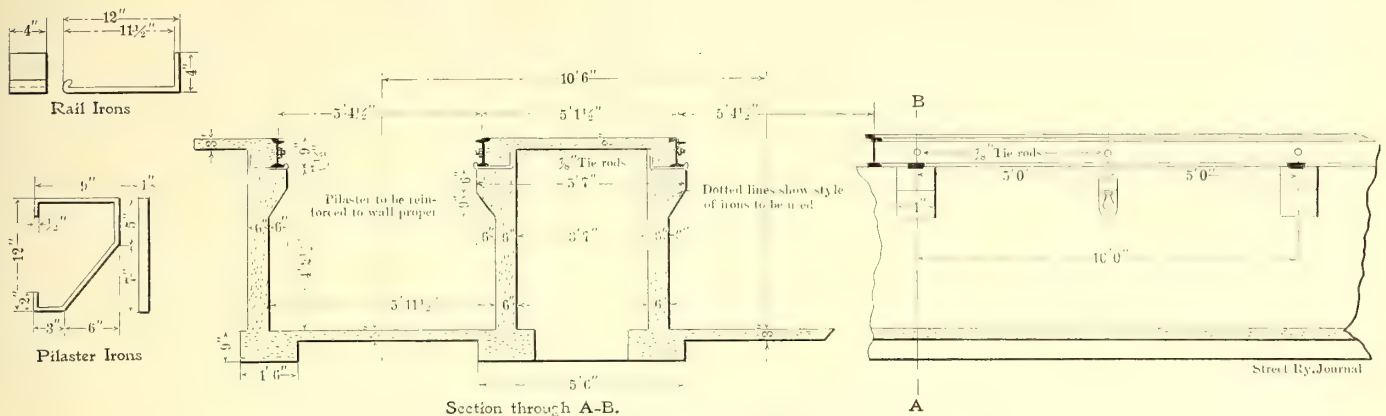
SECTION AND DETAILS OF PITS WITH FLUSH AISLES
